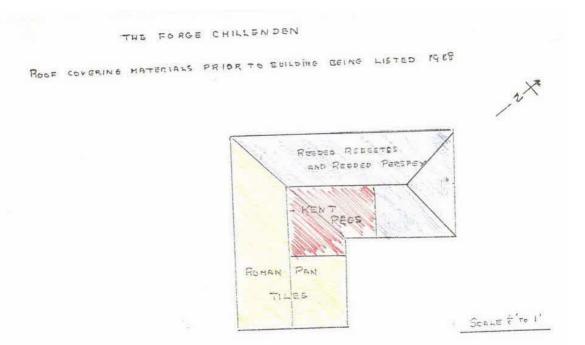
Extract from submission plan (DOV/91/0985) showing the roof covering prior to the Kent peg tiles being replaced with Roman pantiles
